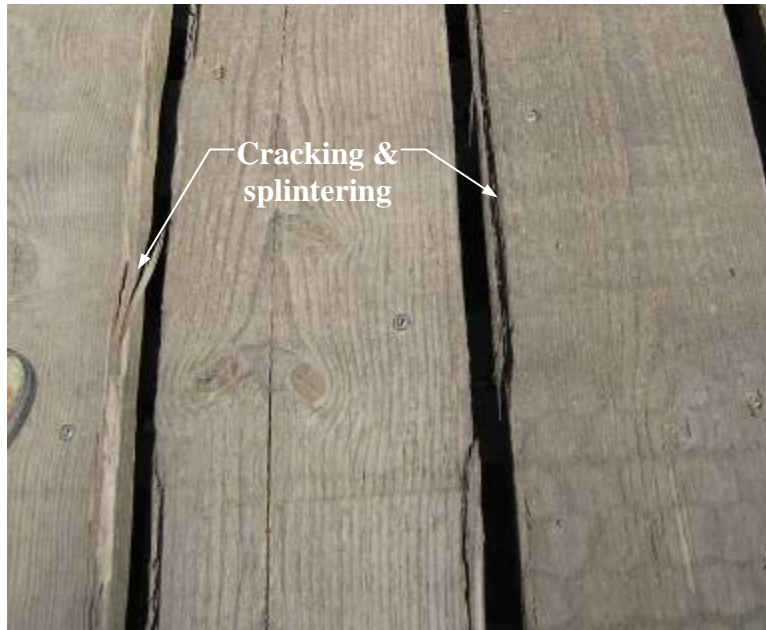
Mechanical damage caused by spacing members apart; deck is screwed down which helped prevent rocking of planks and severe damage
